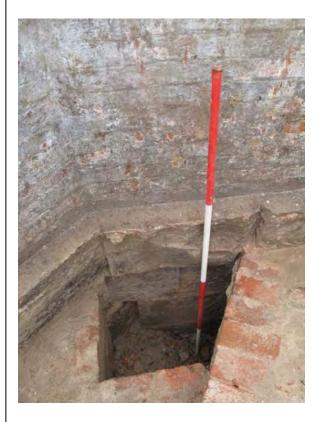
Detail of test pit abutting southern wall (004) of B9, looking south.
